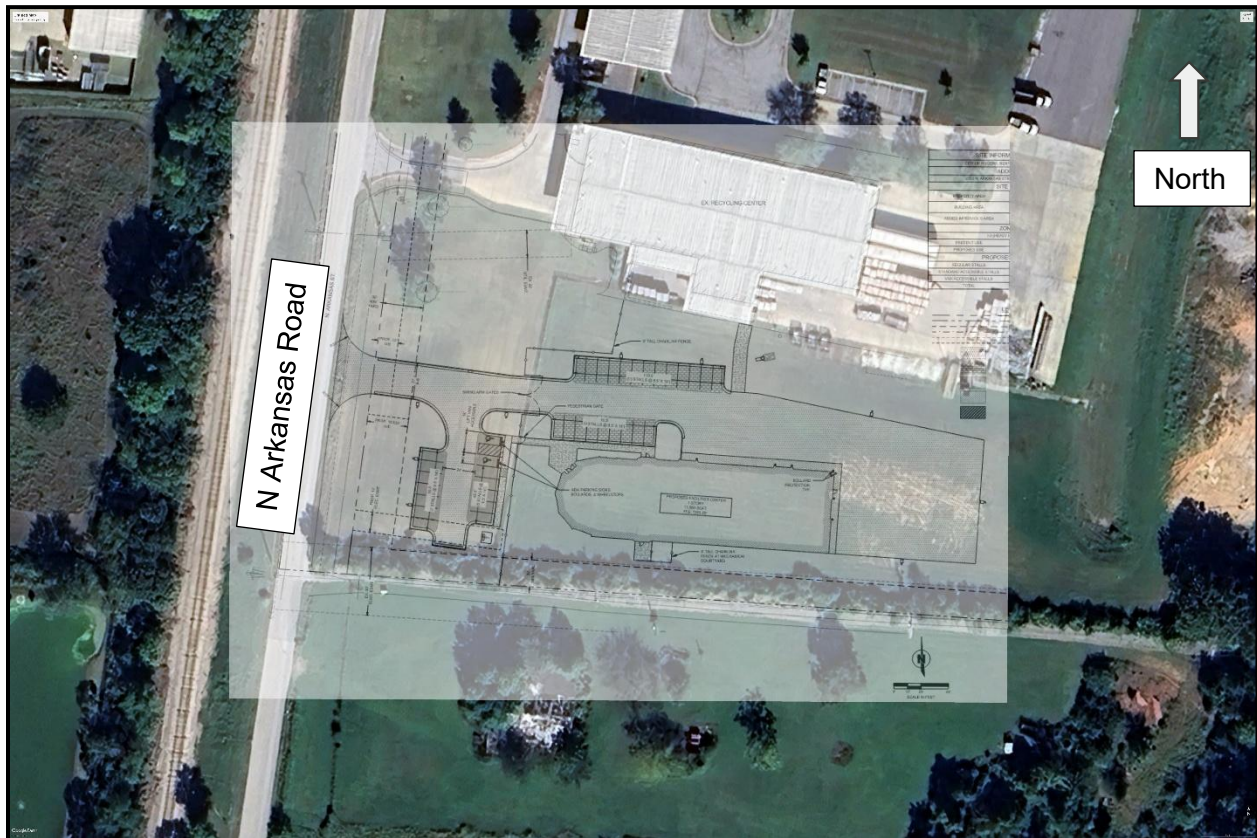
2024 Google Earth Aerial Imagery with Preliminary Site Plan.
